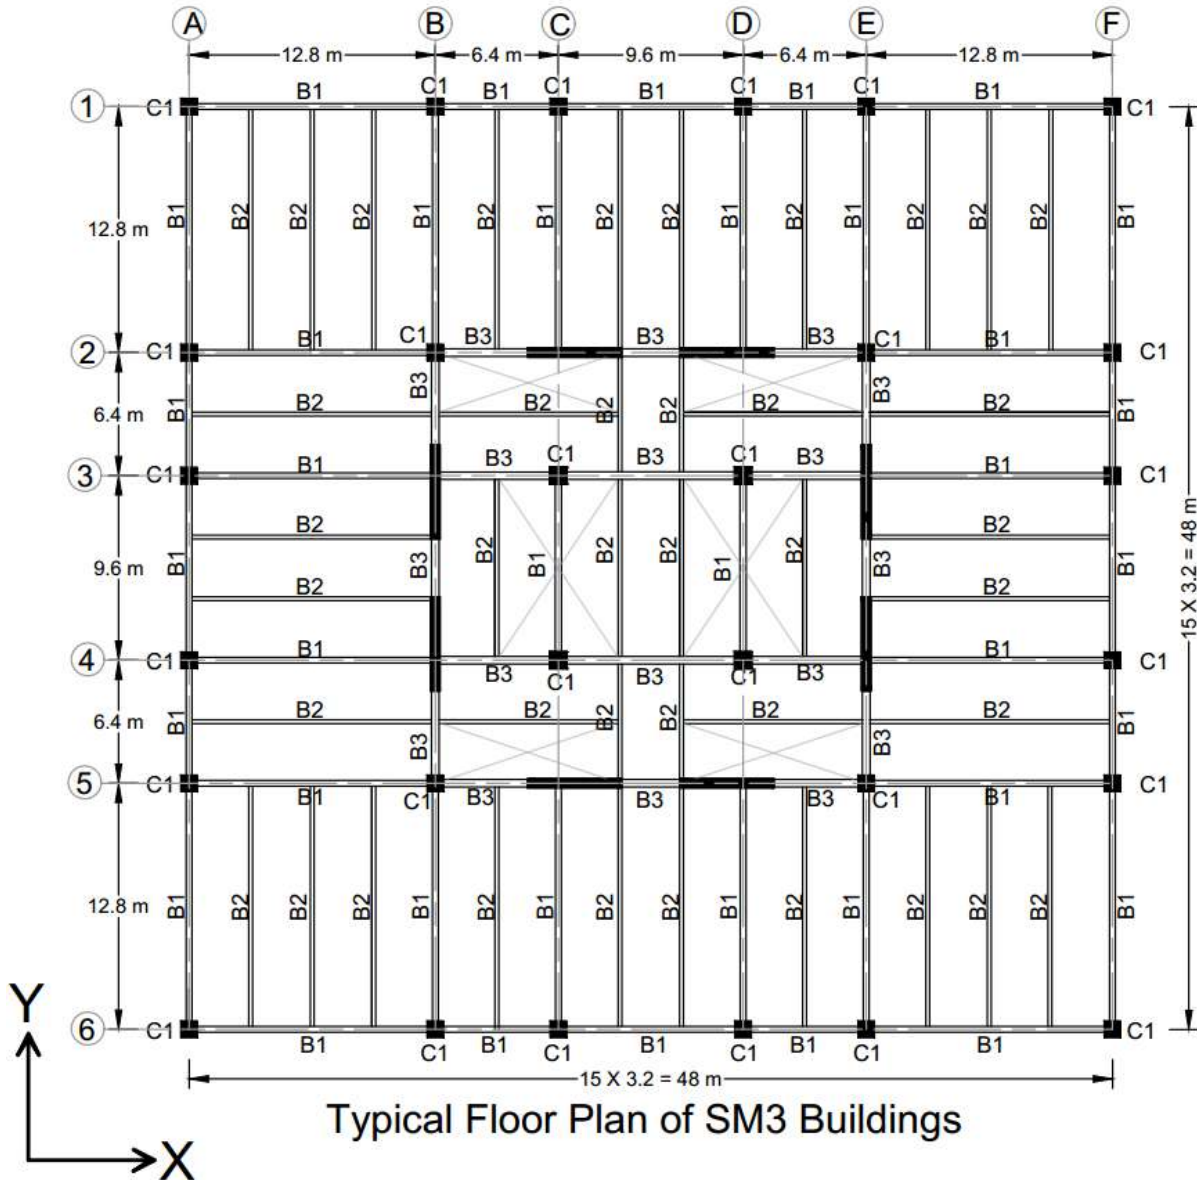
Typical Floor Plan of SM3 Tall Buildings
